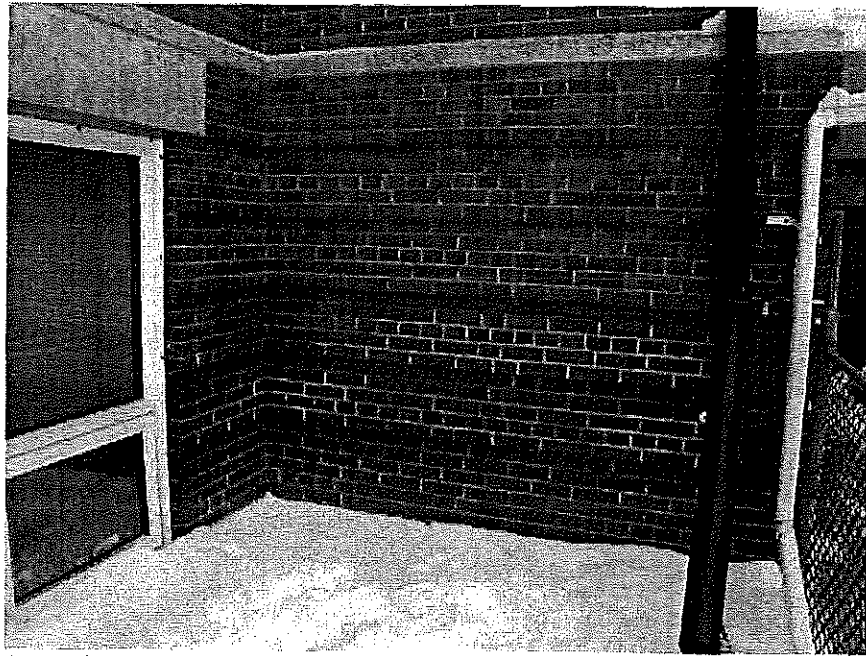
Southwest corner of West façade – areas where more deterioration was noticed
